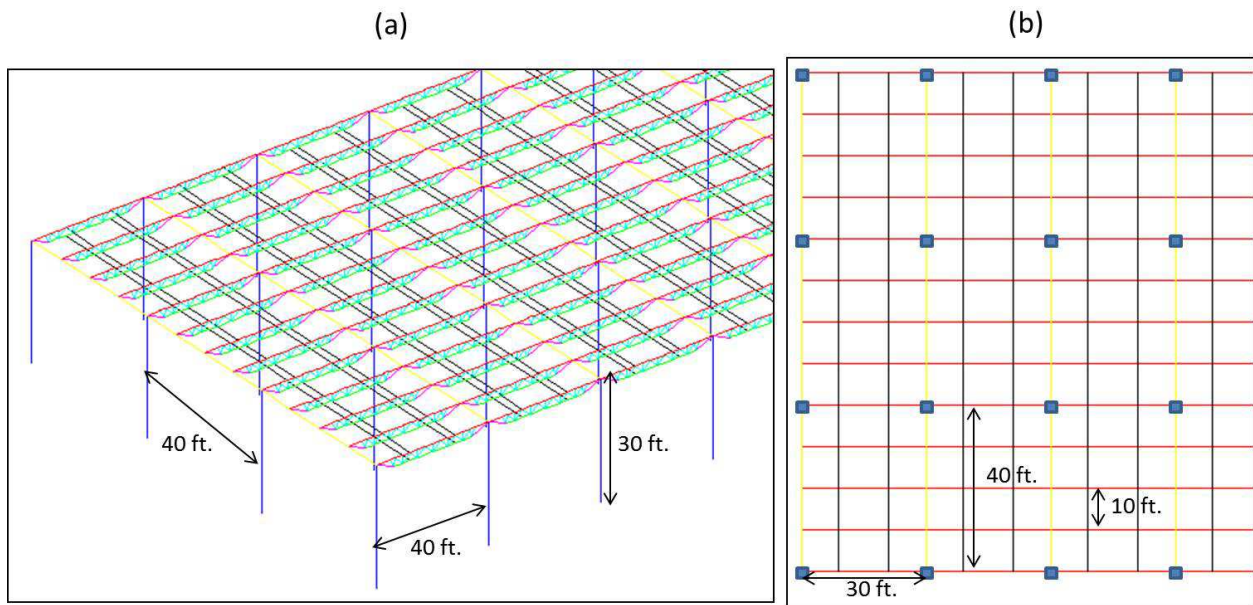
a) 3D view of a portion of the basic building, b) plan view of a portion of the basic building with girders in yellow, joists in red, bridging in black and columns in blue
